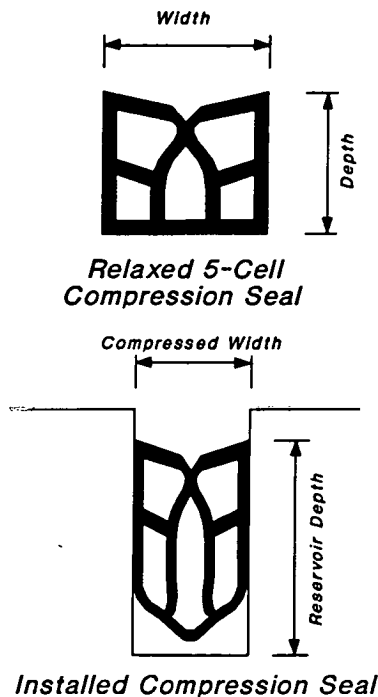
Cross section of typical 5-cell preformed seal (9).
